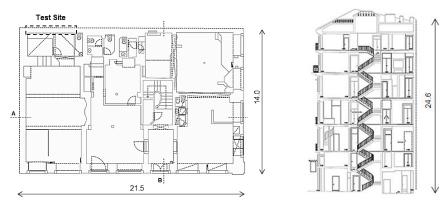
Test site: back façade wall on the ground floor level and vertical cut B (dimensions in meters).
